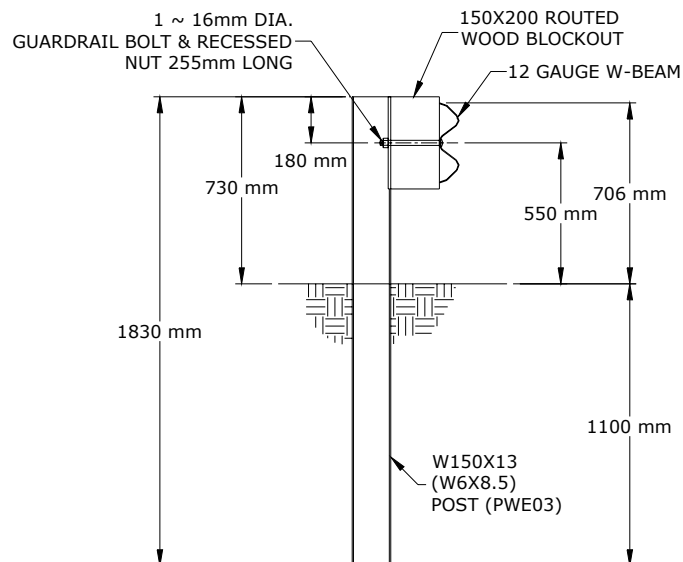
Left Elevation View of G4(1S) Guardrail System.
